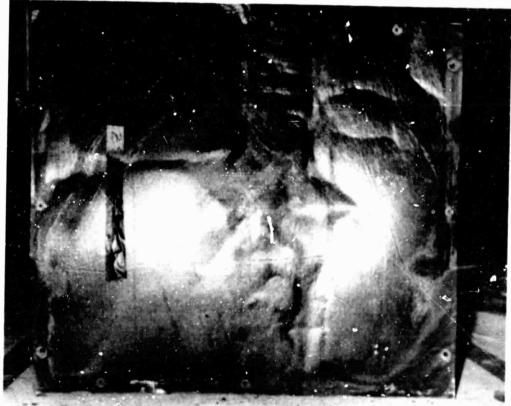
TOP AND BOTTOM OF MODULE B FLOOR
